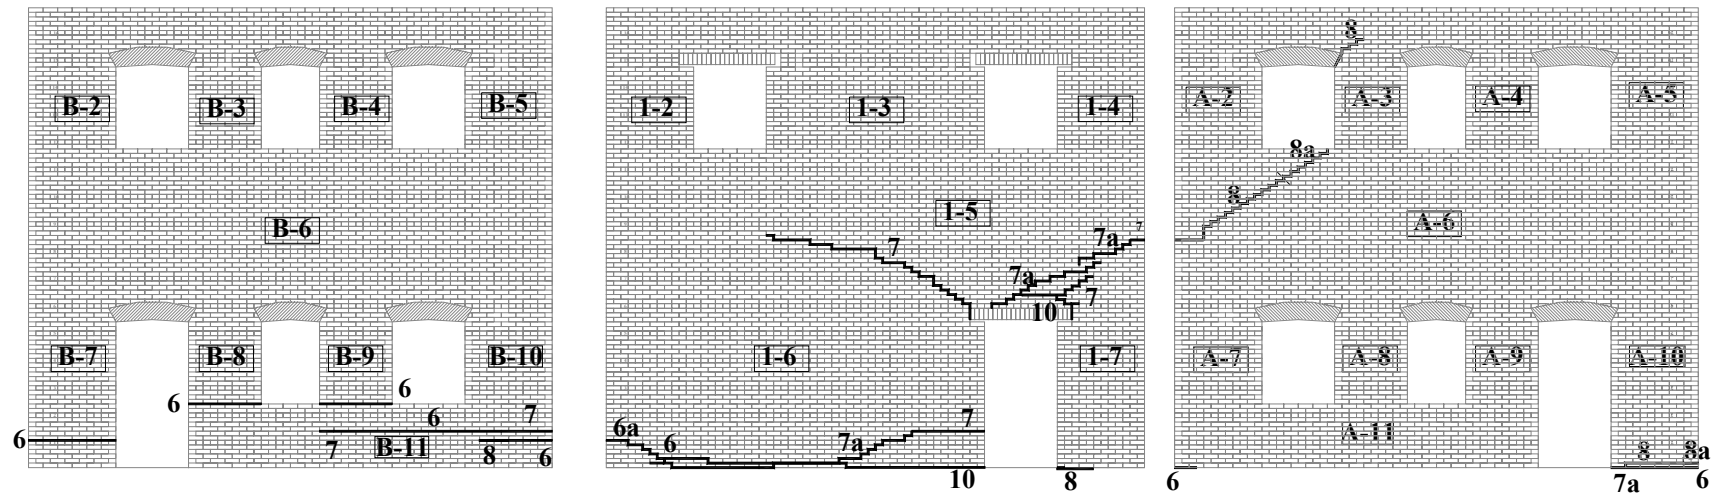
Crack pattern of Wall 1 and adjacent Wall B (left) and Wall A (right) at the end of Cycle 10a. The crack number corresponds to the test run number. Number IDs of each pier are given in the rectangles.
